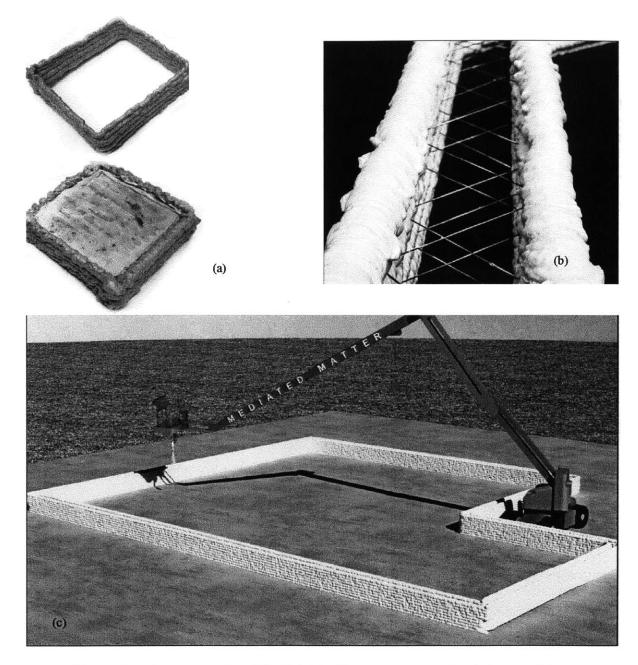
(a) An example of the Print-in-Place process, an insulative, rapidly curing spray foam mould is printed via a robotic arm. Afterwards, the mould is used to cast concrete. (b) Integration of features such metal reinforcement rods to printed moulds is possible. (c) Rendering of robotic arm platform for printing polyurethane wall mould. [16]
